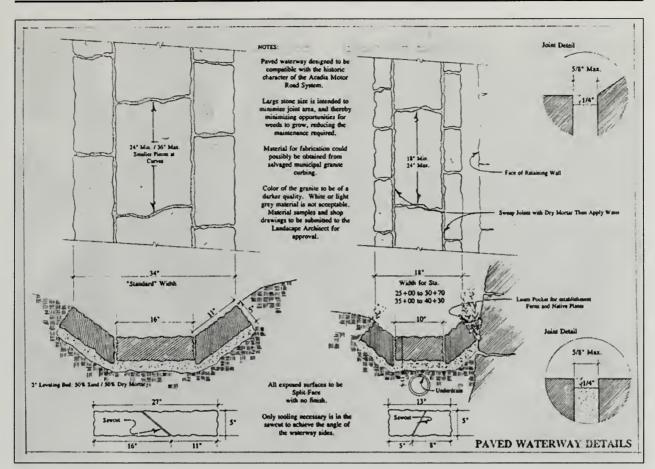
Mortared rubble waterway detail installed near Schooner Head Overlook Access Road. (OCLP 1993)
